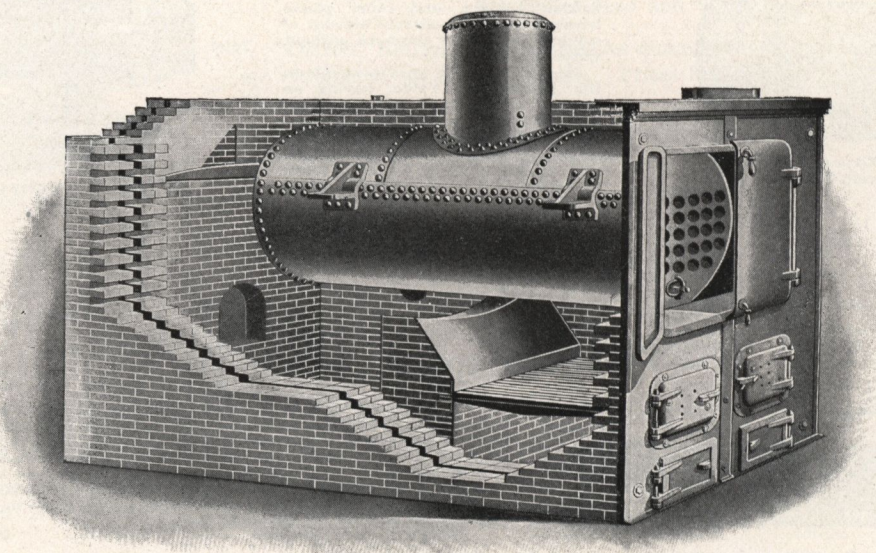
Return Tubular Boiler with Full-Arch Front Setting
